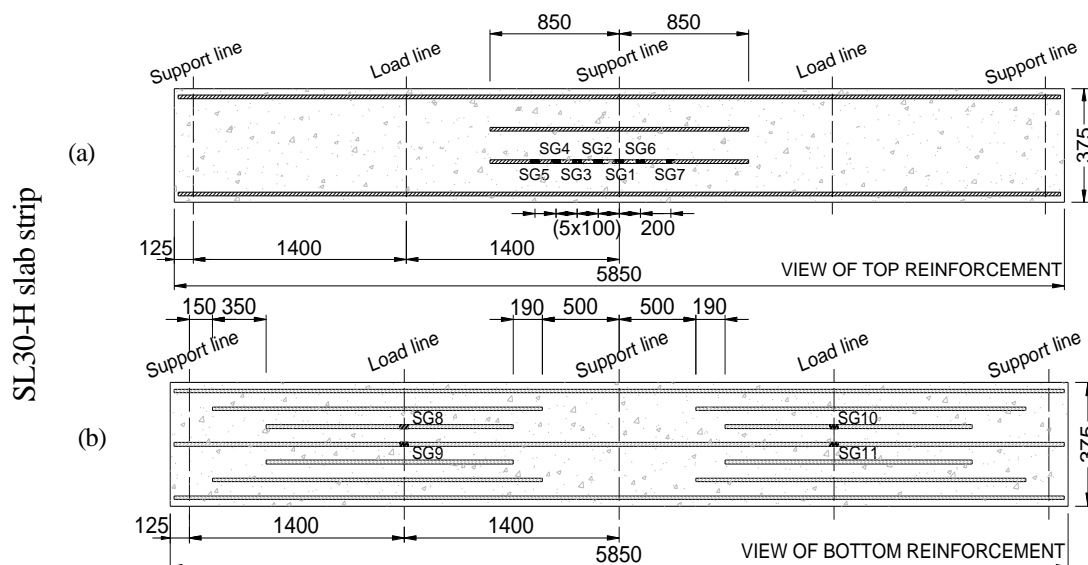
Arrangement of the longitudinal steel reinforcement of the SL30-H slab strip.
